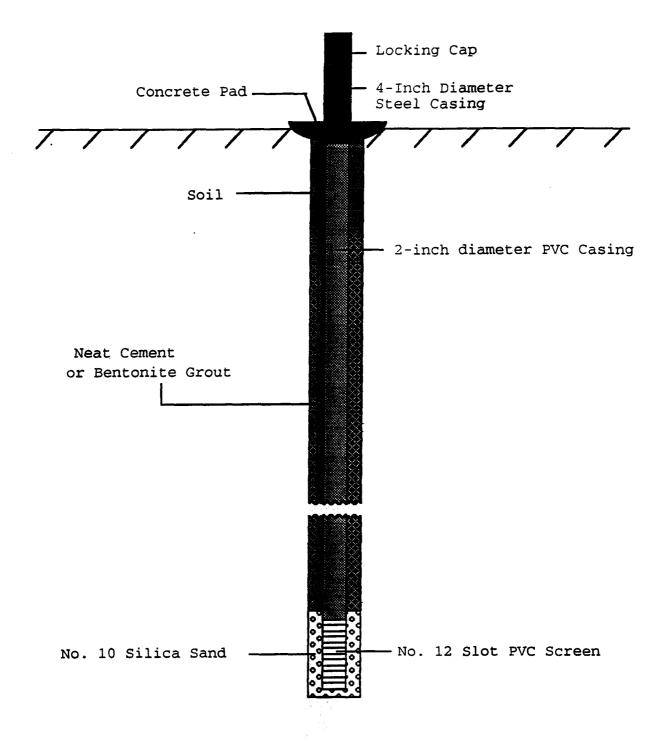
Construction design used for monitoring wells installed at the Valley City landfill.
